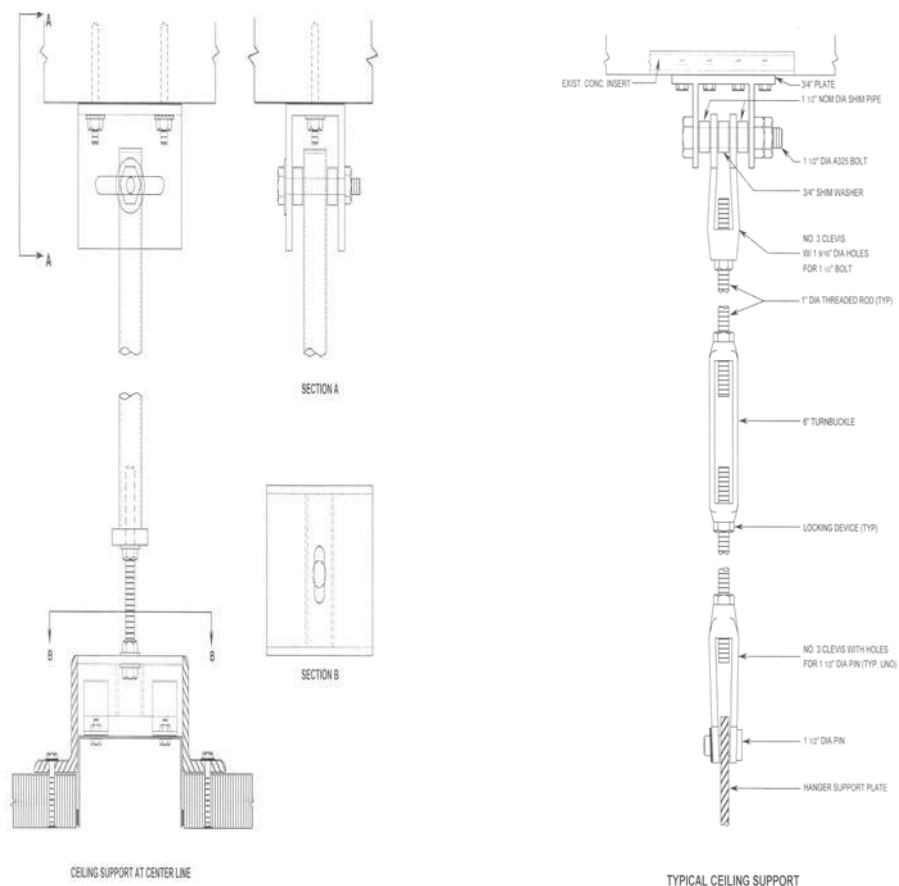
Typical Hanger Supports for Suspended Ceiling
